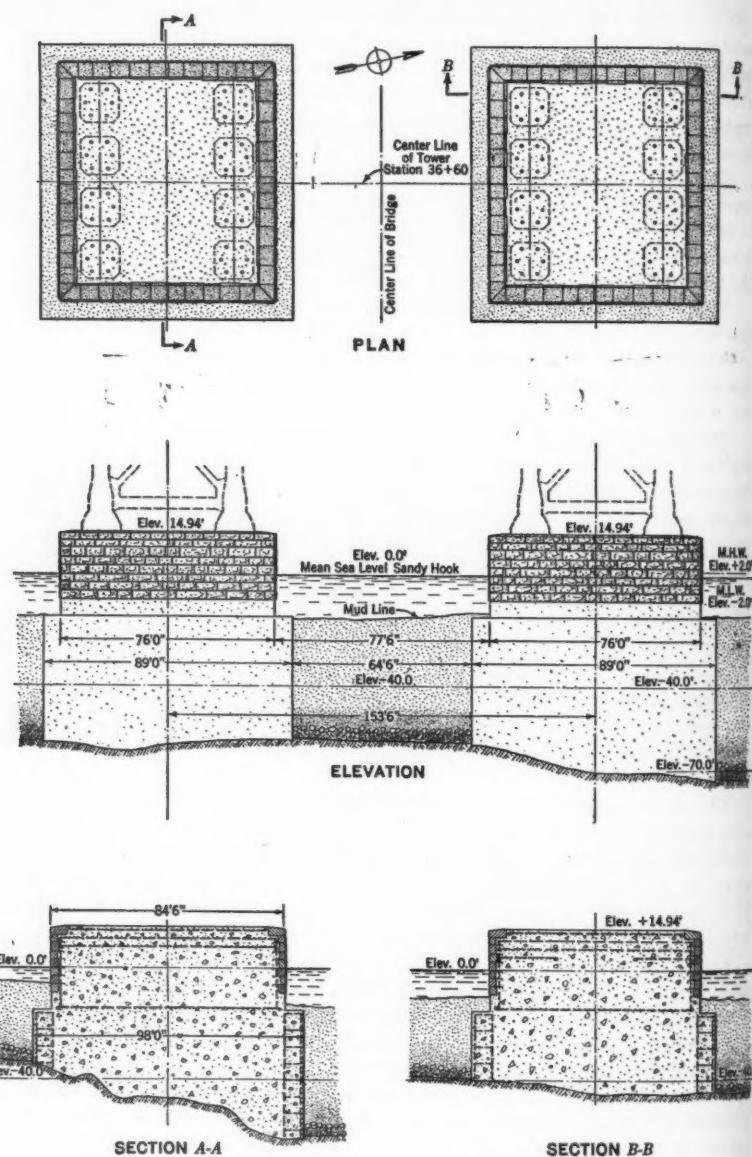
SECTIONS SHOWING DESIGN OF NEW JERSEY TOWER FOUNDATIONS.
